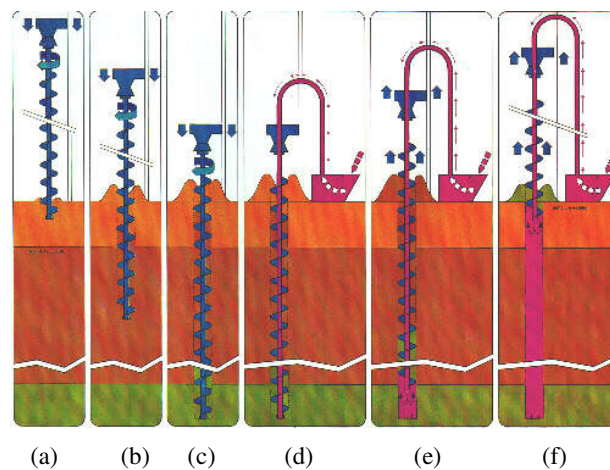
Stages for installation of CFA piles (www.geoforum.com)
